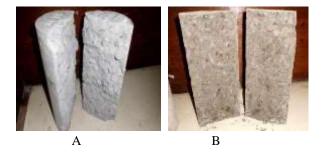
Cylindrical concrete of organic cement (A). Cylindrical concrete of portland cement (B)
